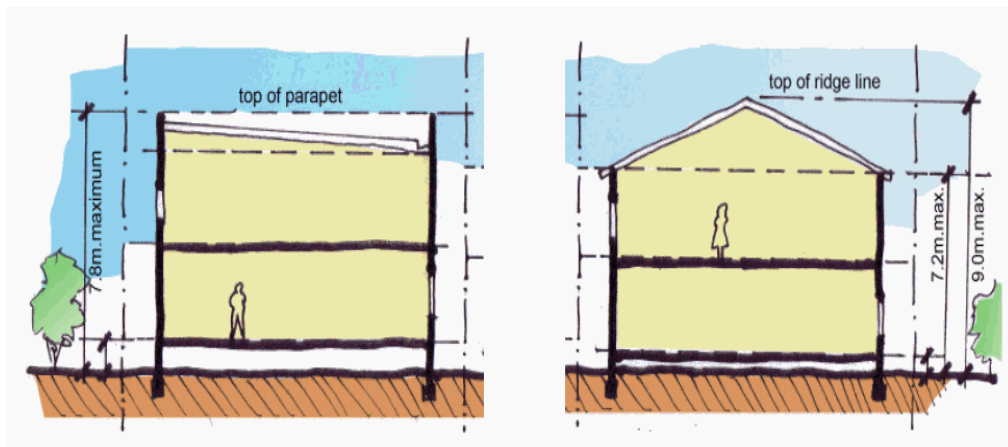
Application of height controls for a two level flat roof and two level pitched roof building for dwellings and dual occupancy development
